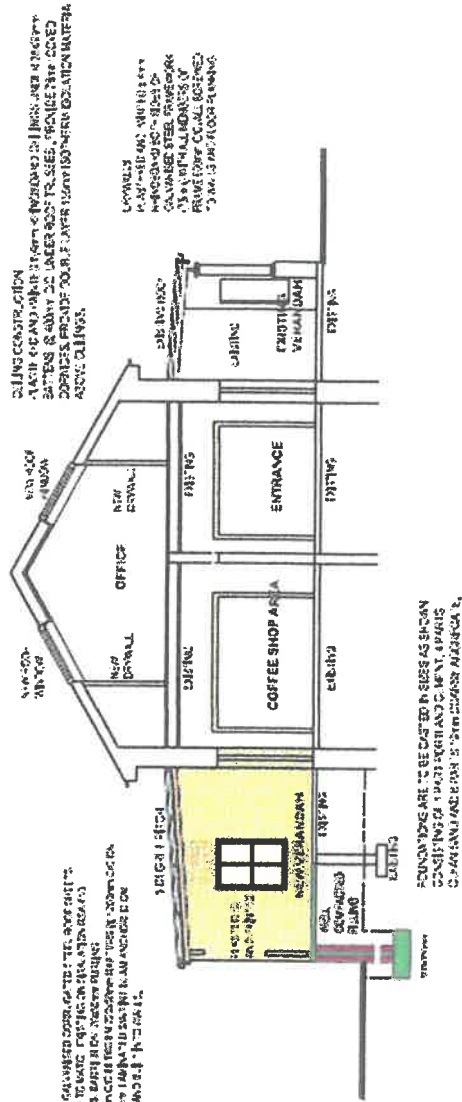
CROSS SECTION SHOWING PROPOSED USES (OFFICE & SHOP) IN THE EXISTING BUILDING ON ERF 230 FRANSCHOEK
